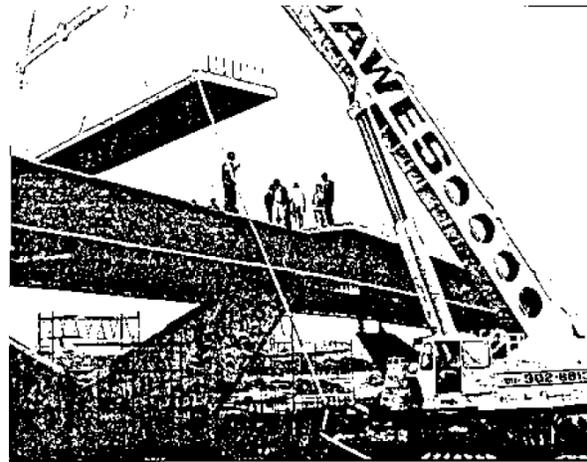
Precast Concrete Deck Planks were placed with Minimal Disruption to Traffic on the Freeway
